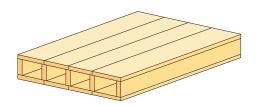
Example of a cassette floor, with CLT slab reinforced by glulam web joists and flanges plus a suspended ceiling.
